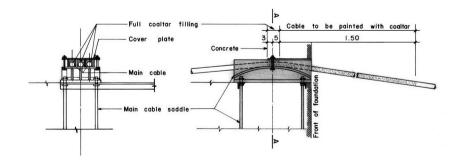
DETAIL OF CABLE FITTING AND PROTECTION AT SADDLE
